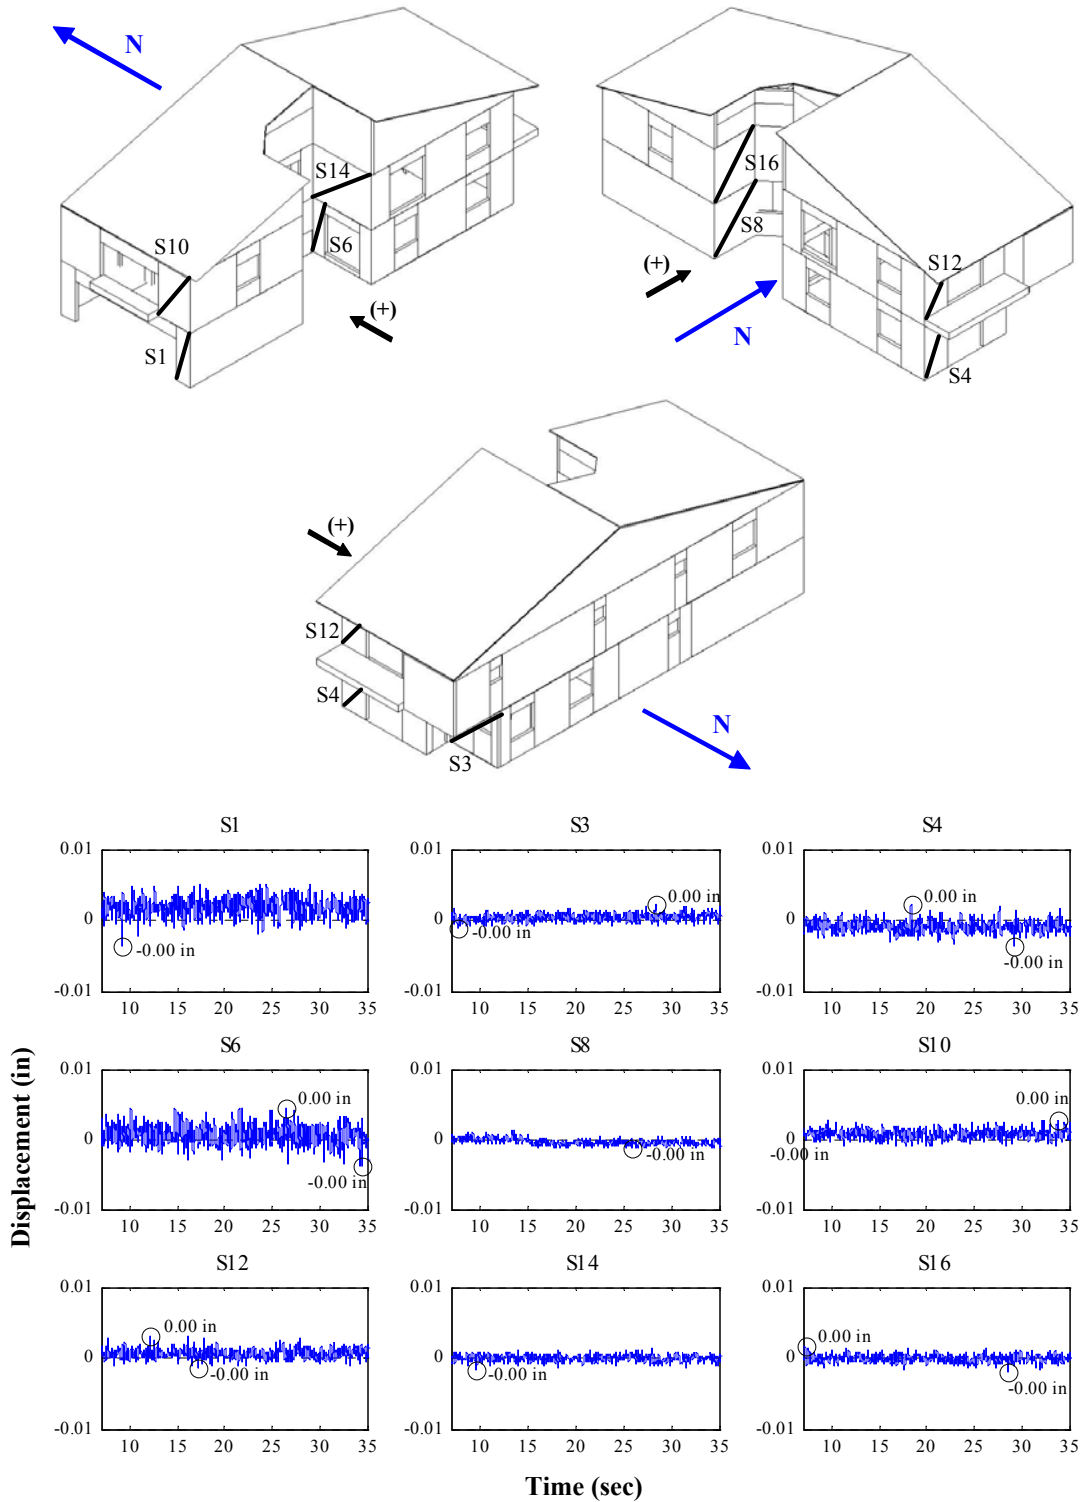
Wall deformations of north-south external walls for Test NWP2S01
